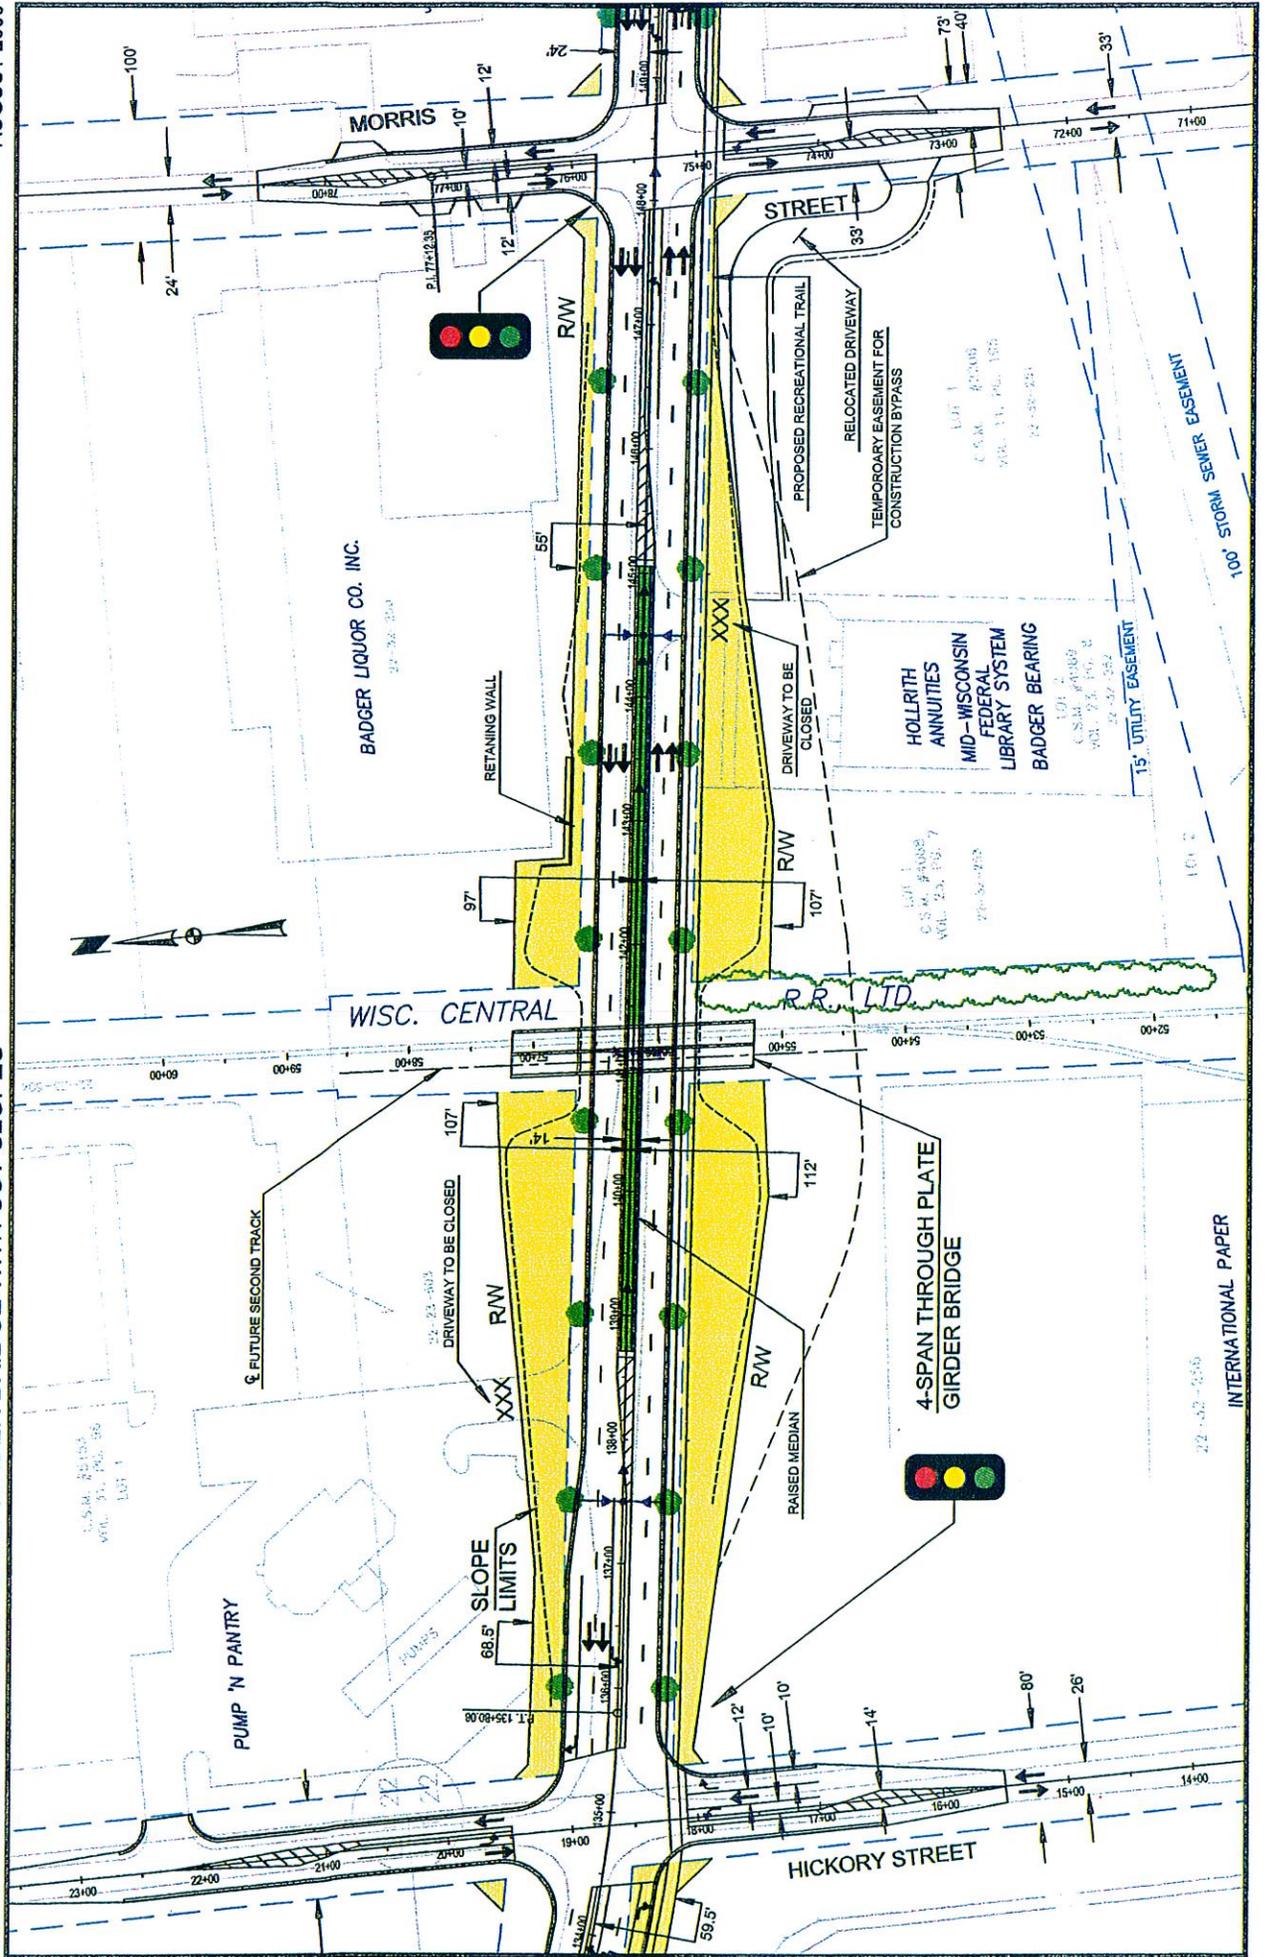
4-SPAN THRU PLATE GIRDER BRIDGE WITH CUT SLOPES
